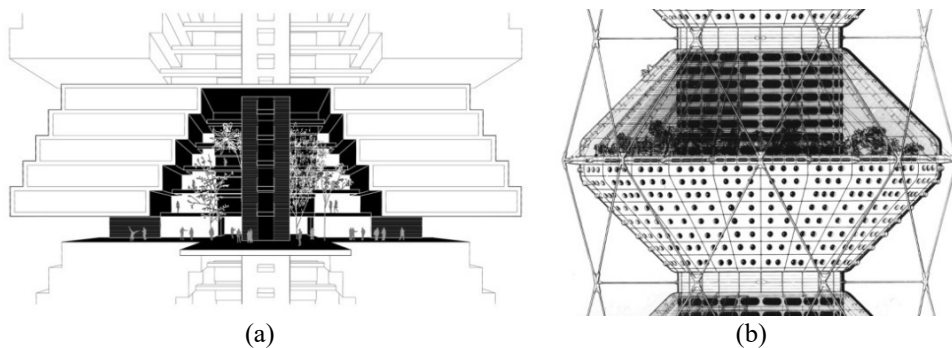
(a) Three dimensional section of “ground floor” *Tree-shaped Community* (Source: Diagram by the author); and (b) Detail of *The Coexistence Tower* [9].
